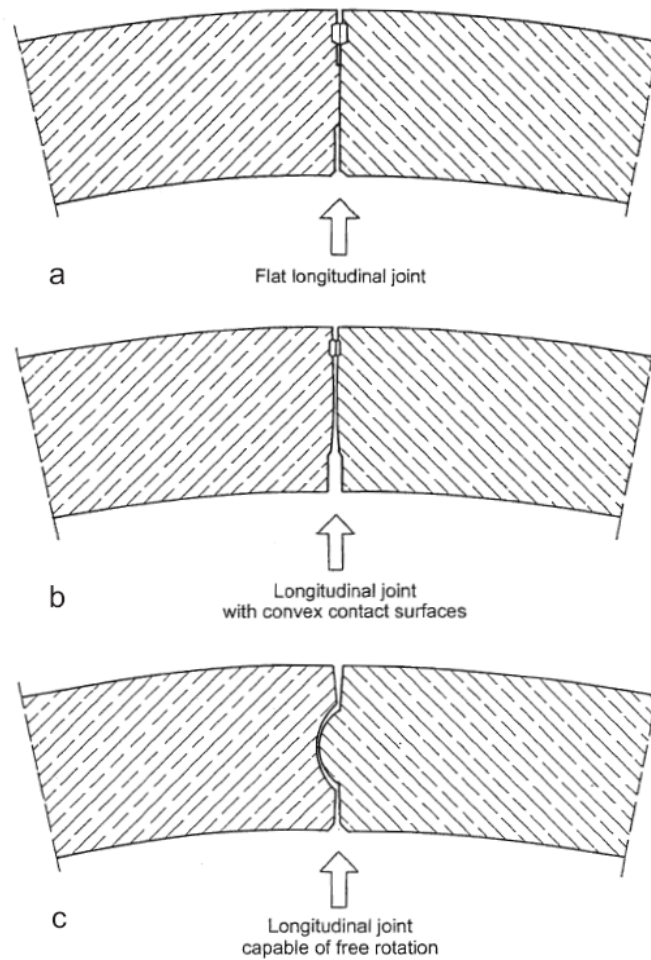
Longitudinal joints with a) two flat surfaces, b) two convex surfaces, c) convex / concave surfaces [13]
